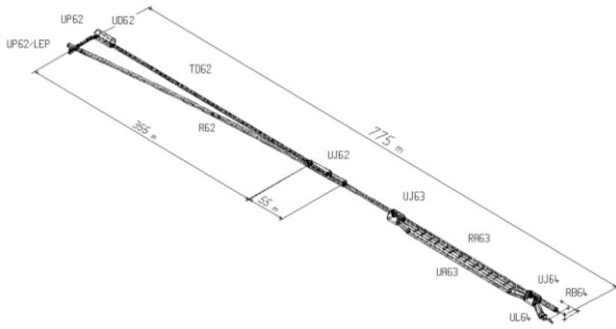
Underground layout for the left side of P6, showing the dump tunnel and UD62 cavern for Beam 2.
